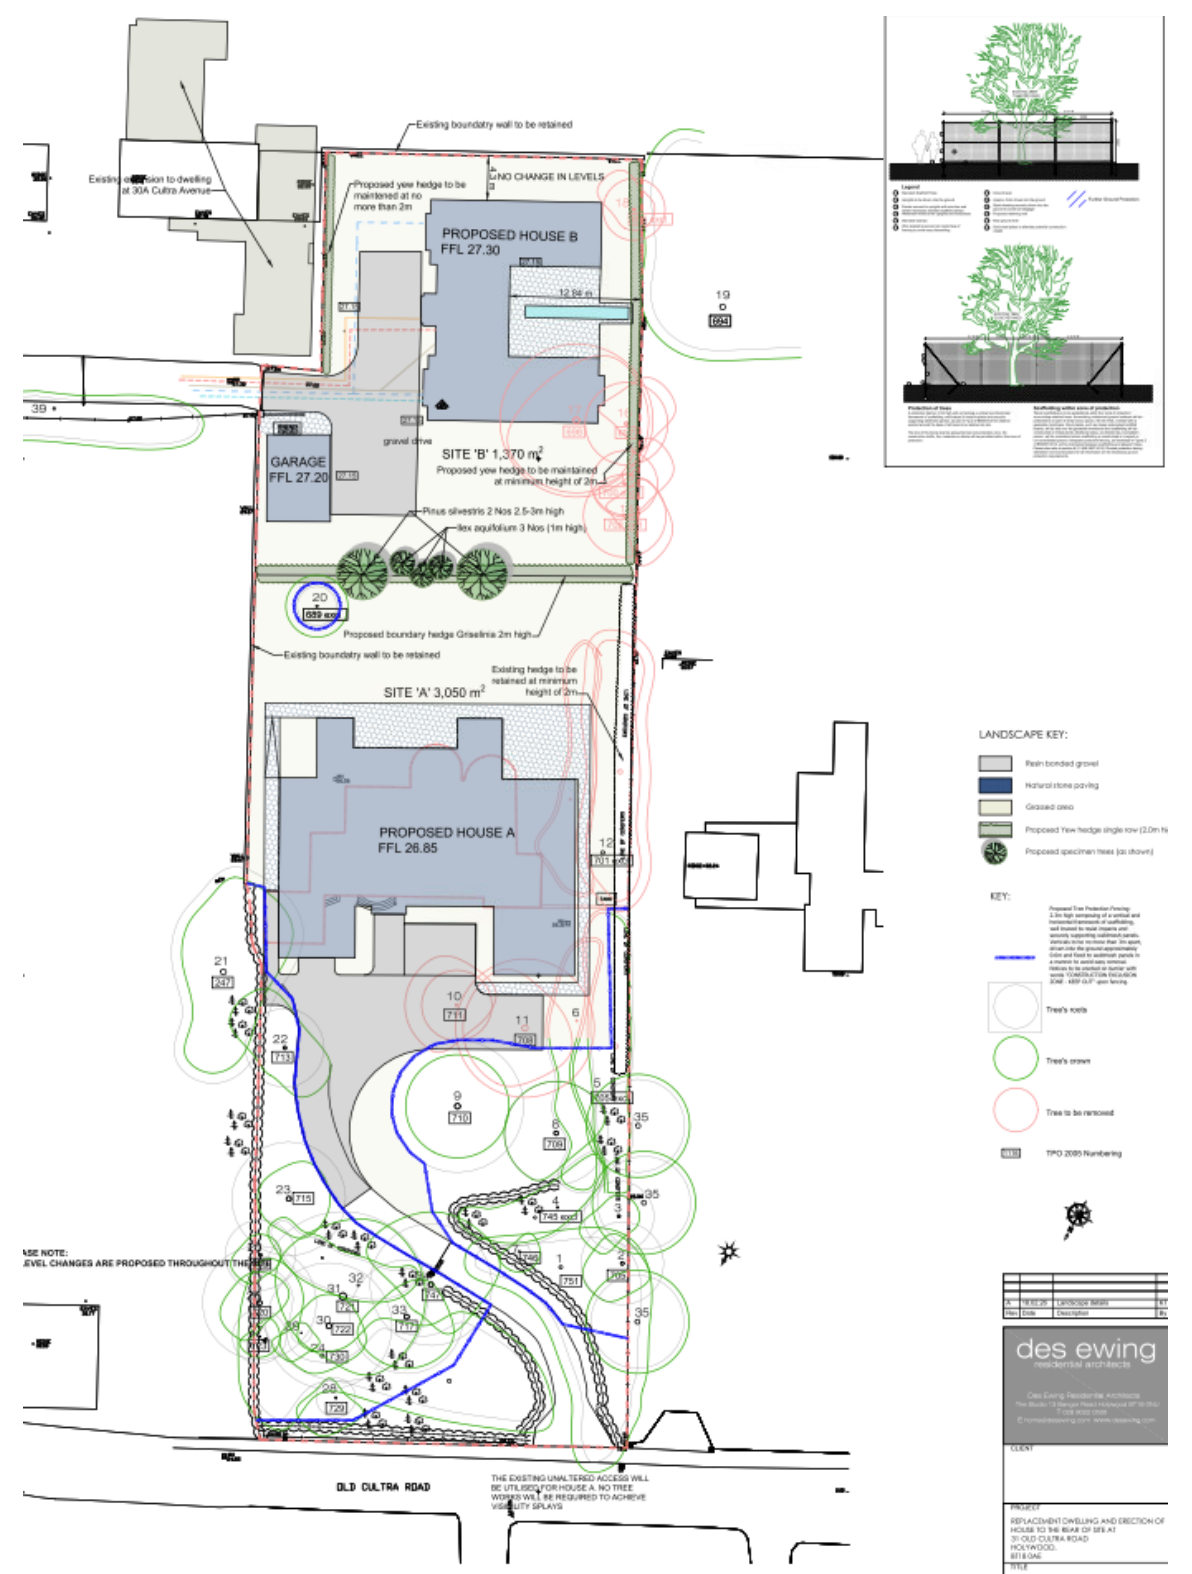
Extract from Proposed Site Plan, Drawing LA06/2024/0222 08C showing trees and landscaping. Protective fencing shown in blue (conditioned)
